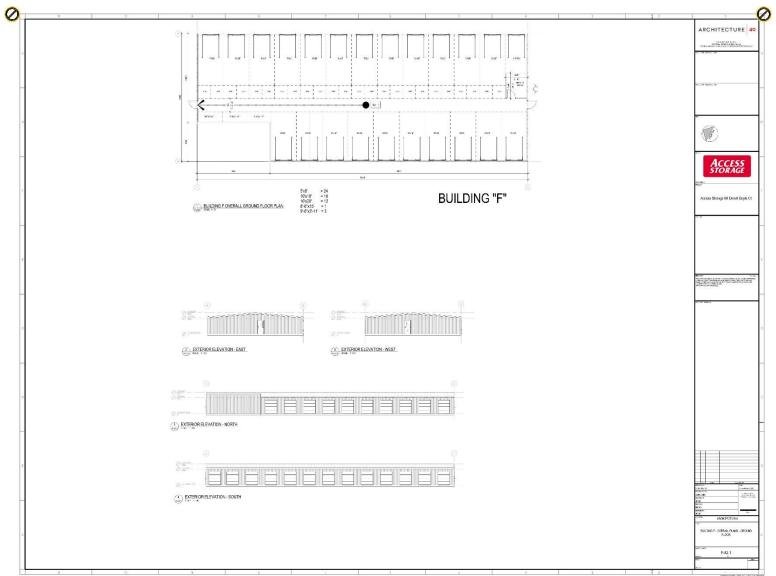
Proposed Building Elevations and Floor Plans – Building F (prepared by Architecture 49, dated November 11, 2022)
